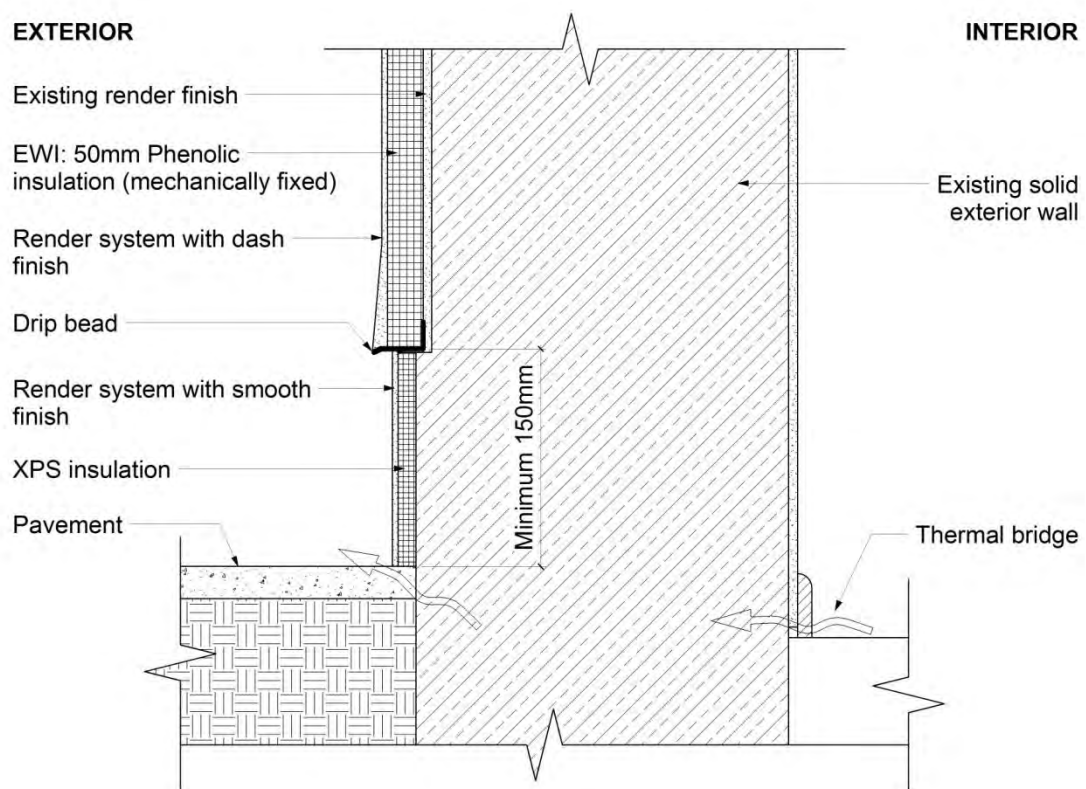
Pavement to external wall junction detail as observed on site (Source: Hopper *et al* 2012b)
